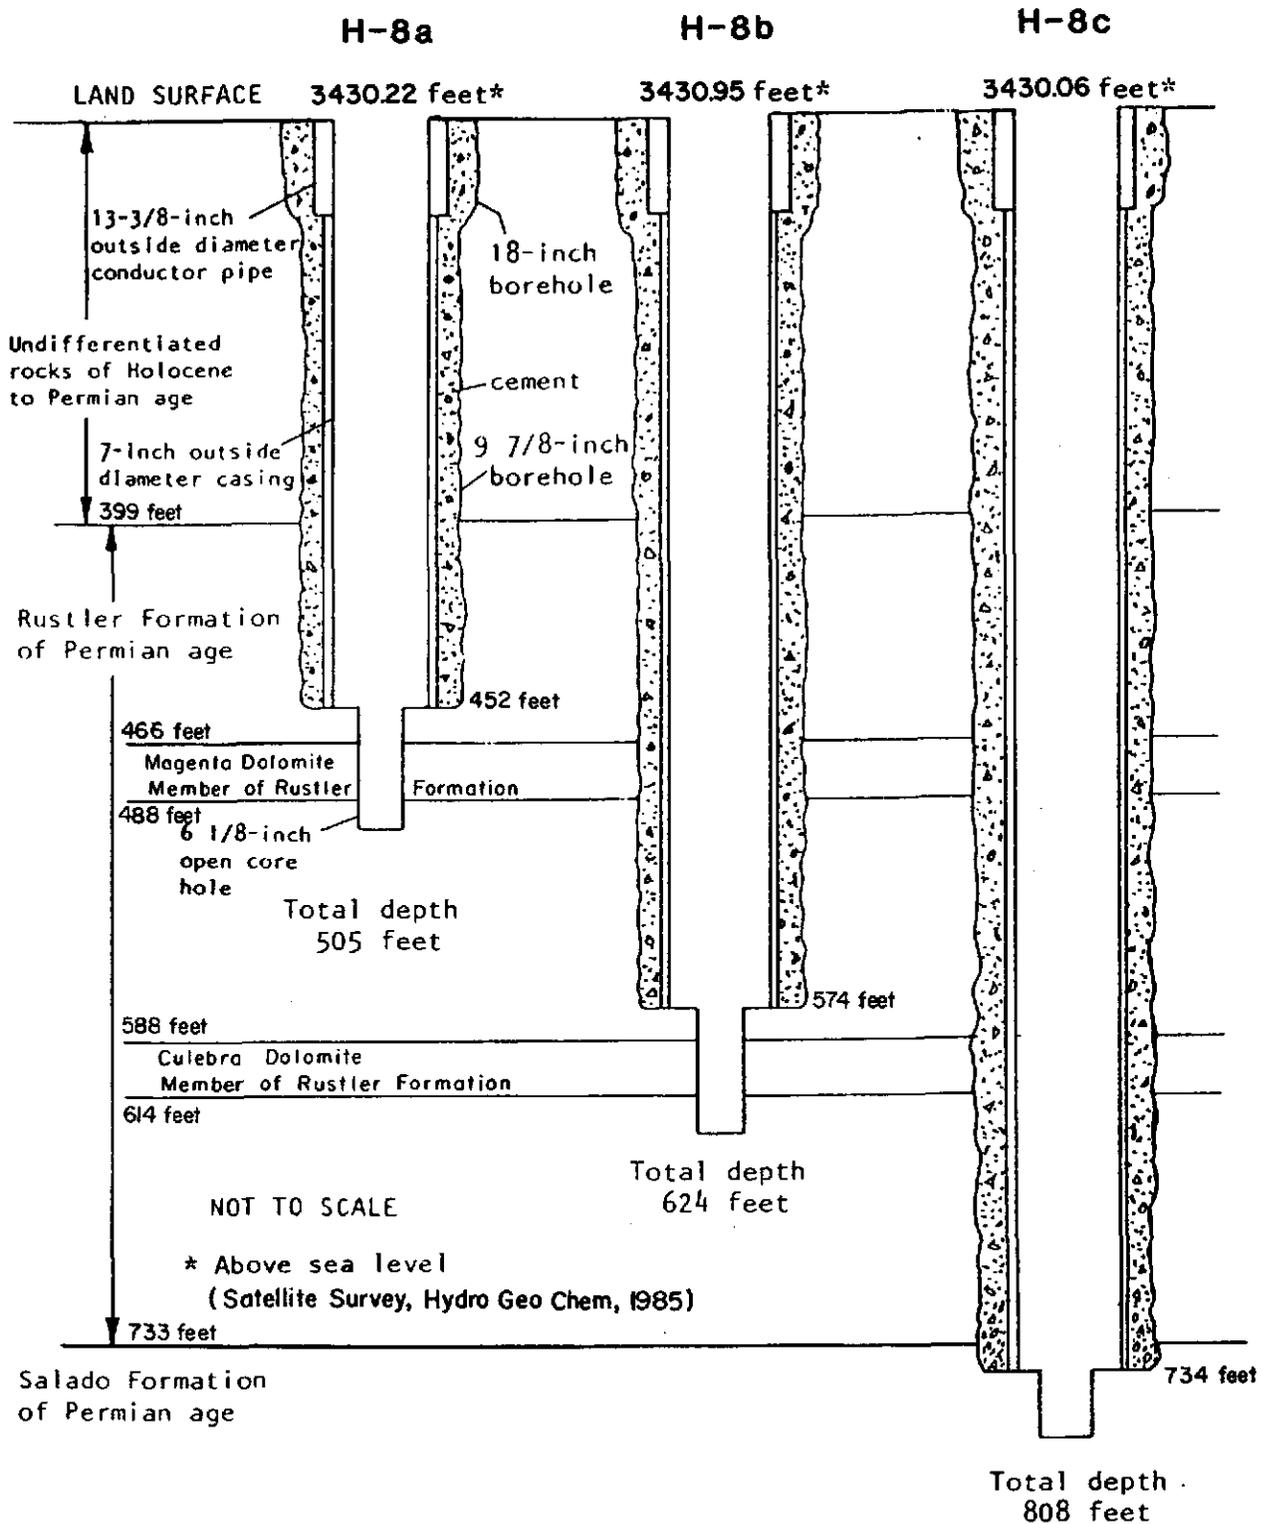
Well construction details for the H-8 hydropad. (After Wells and Drellack, 1982)
